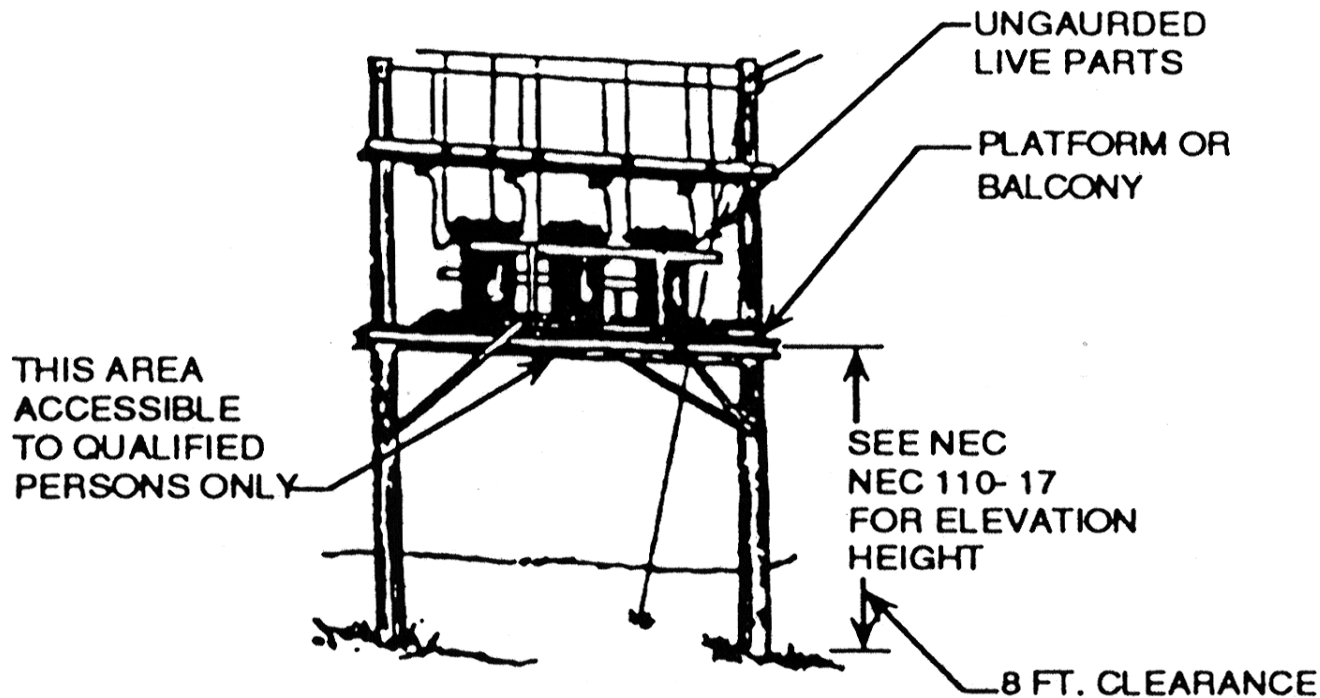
Live parts in electrical equipment shall be guarded or enclosed.
